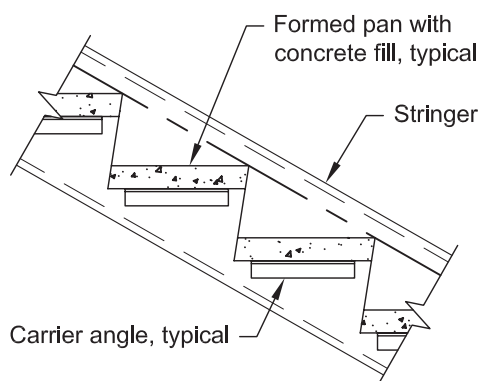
Stringer with welded metal pan for treads and risers.
